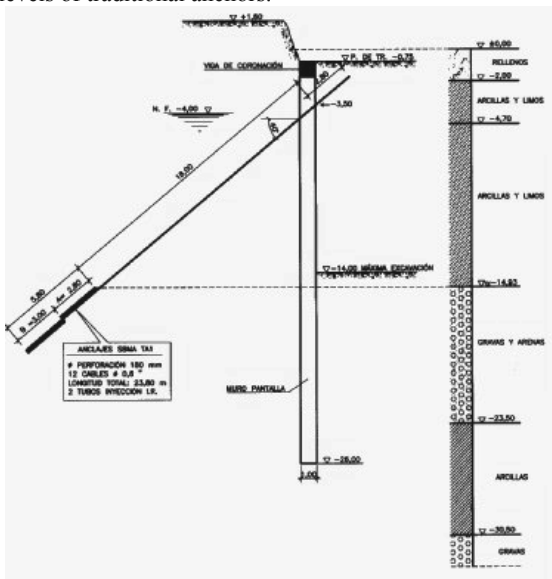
Section of diaphragm wall with trial anchor test TA1.
